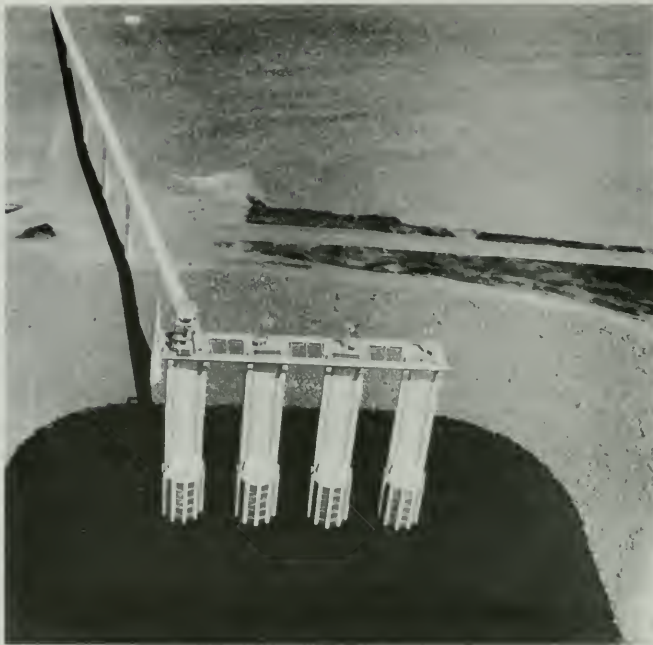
Trashrack Structure and Access Bridge—San Luis Dam
